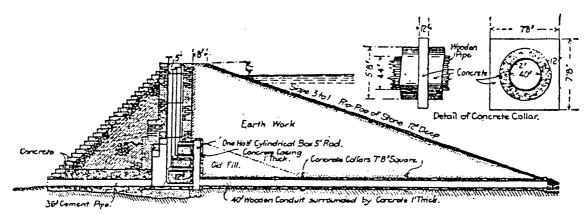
Castlewood Dam; cross section through intake/outlet works and upstream berm after reconstruction (Schuyler, 1909).
